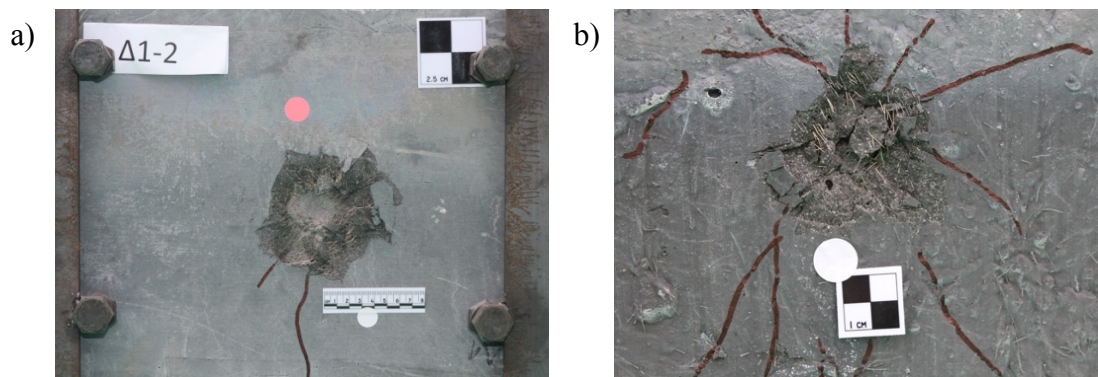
Damage on specimens made from UHPFRC containing 1 % of steel fibers: front face damage (a) and rear face damage (b).
